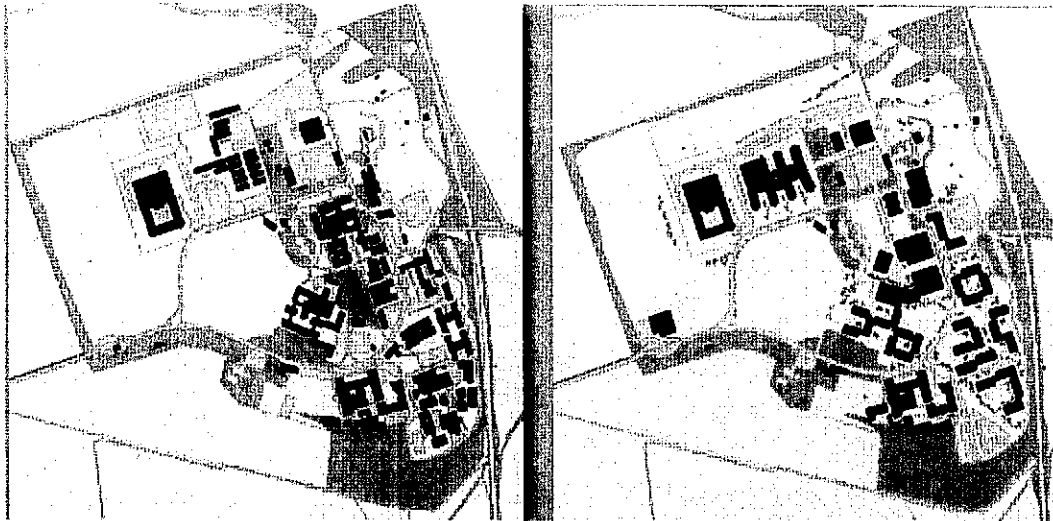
Existing Ground Floor Footprint Indicative Proposed Ground Floor Footprint
